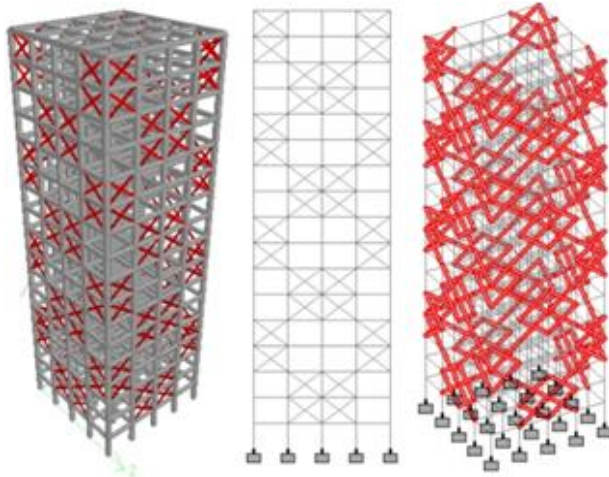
RC Building with X-Bracing in 3D- view (Arrangement 5)
